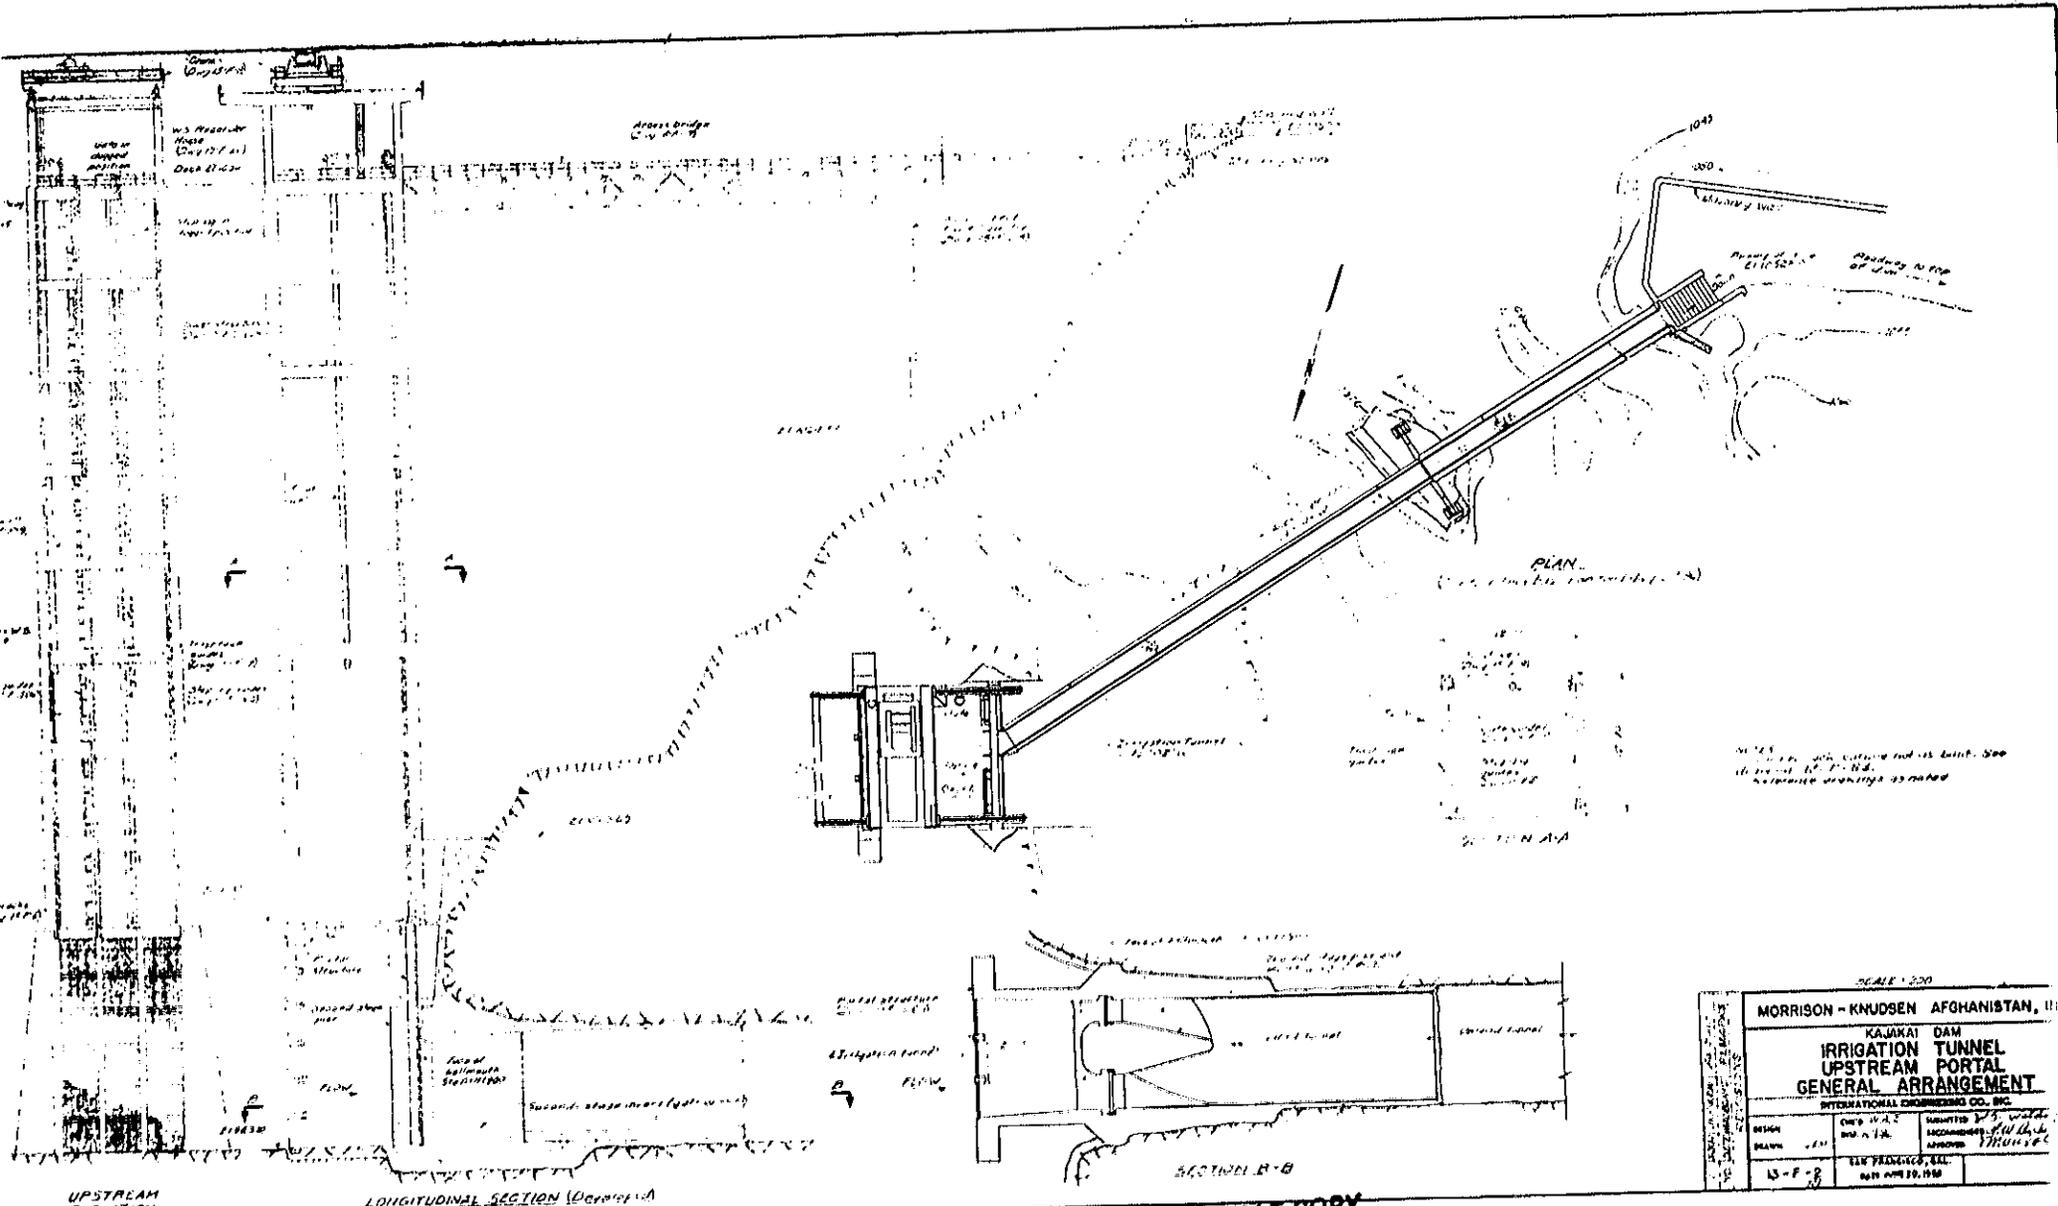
Kajakai Dam. Open frame intake structure showing the walkway bridge, hoist, and intake gates in the storage position.
